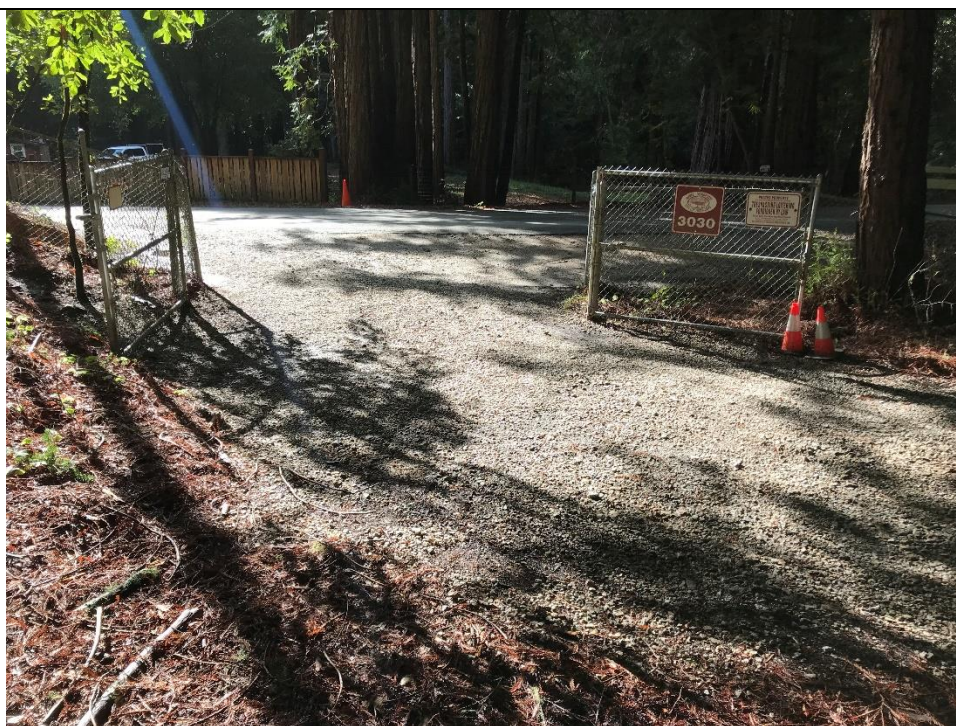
Main access road turnoff from Smith Grade Road. View facing southwest.
